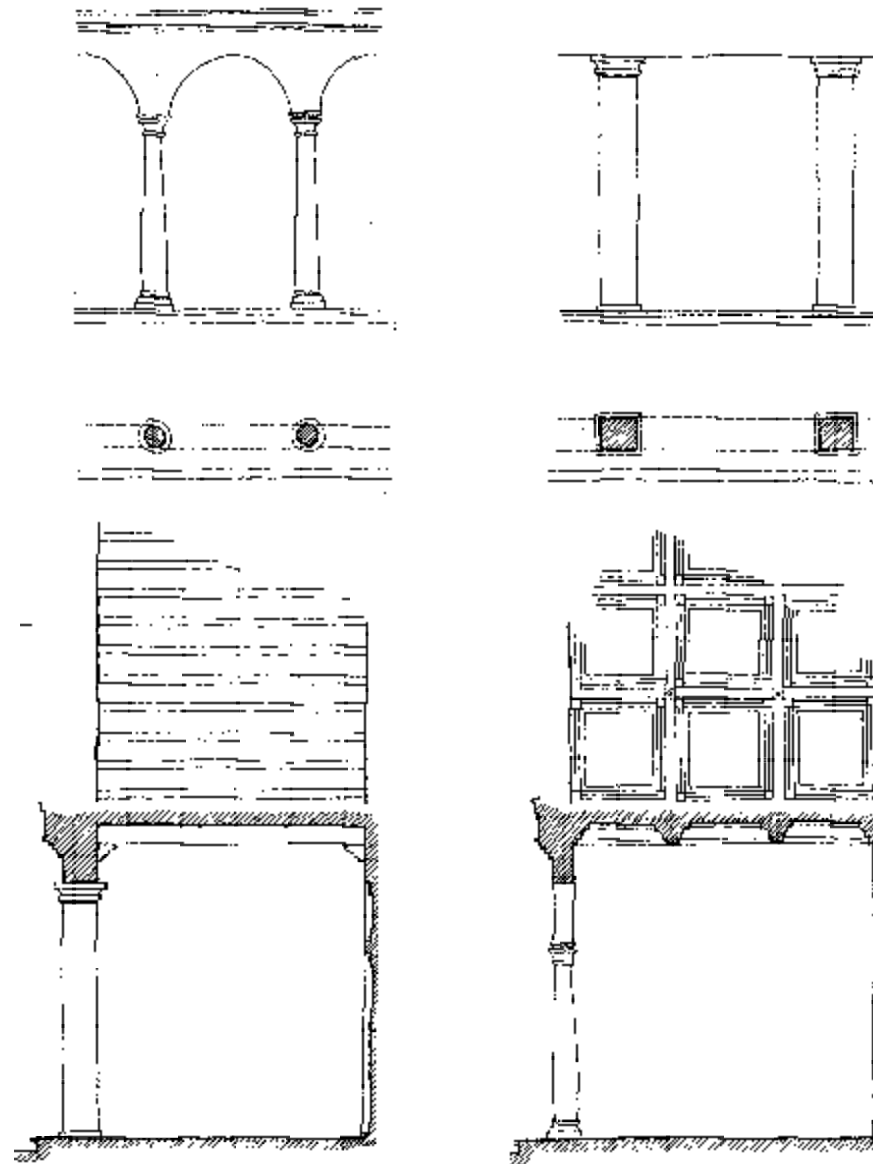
LOGGIAS & ARCADES shown with alternative details.
